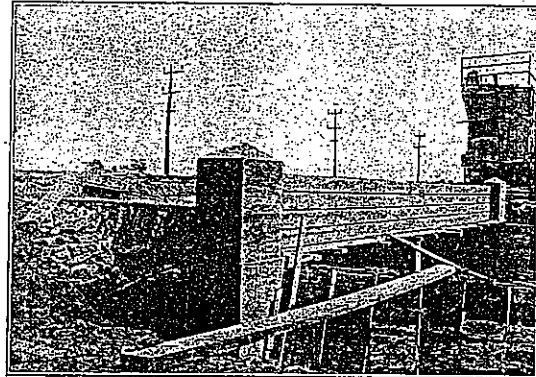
Southwest Corner of Bridge, Showing Waterproofing.
